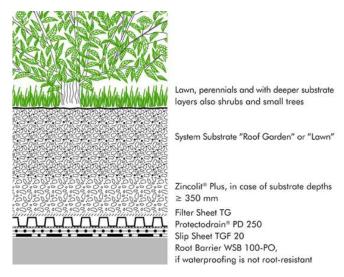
Construction Detail of Parklands on Rooftops (source :zinco-greenroof.com)
